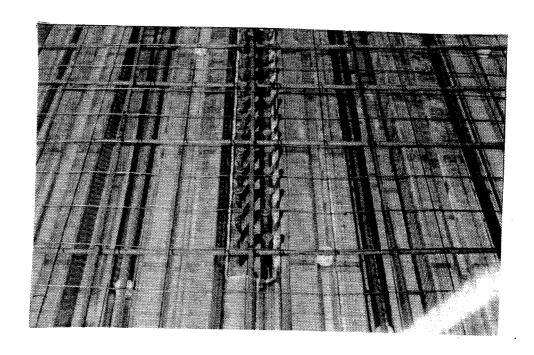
Placement of Stud Shear Connectors on Exterior Stub of Full-Size Stub-Girder
